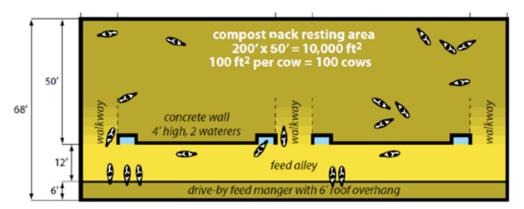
Compost barn layout for 100 cows. This layout has three walkways to access the pack, drive-by feeding, and 6-foot overhang. Waterers are against the concrete wall, separating the bedded pack from the feed alley. They are accessed only from the feed alley. Not drawn to scale.
